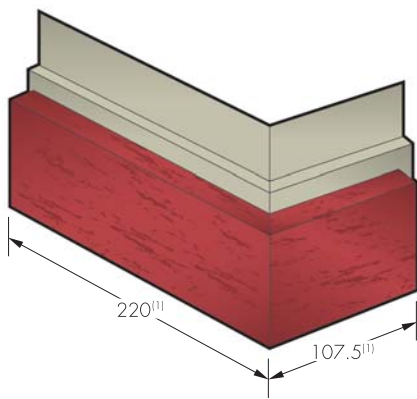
Fastclad panel and corner elements (all dimensions in mm)
